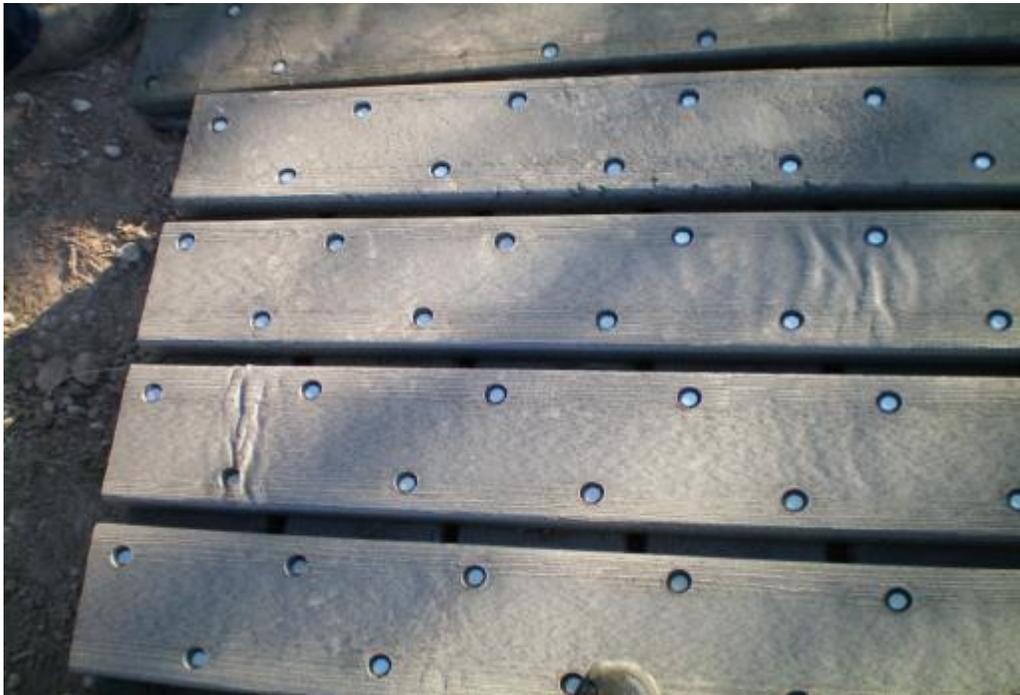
Wyoming Flat mats with cross hatch design. Note bolts used to connect upper and lower sections which are 90 degrees apart in direction.
